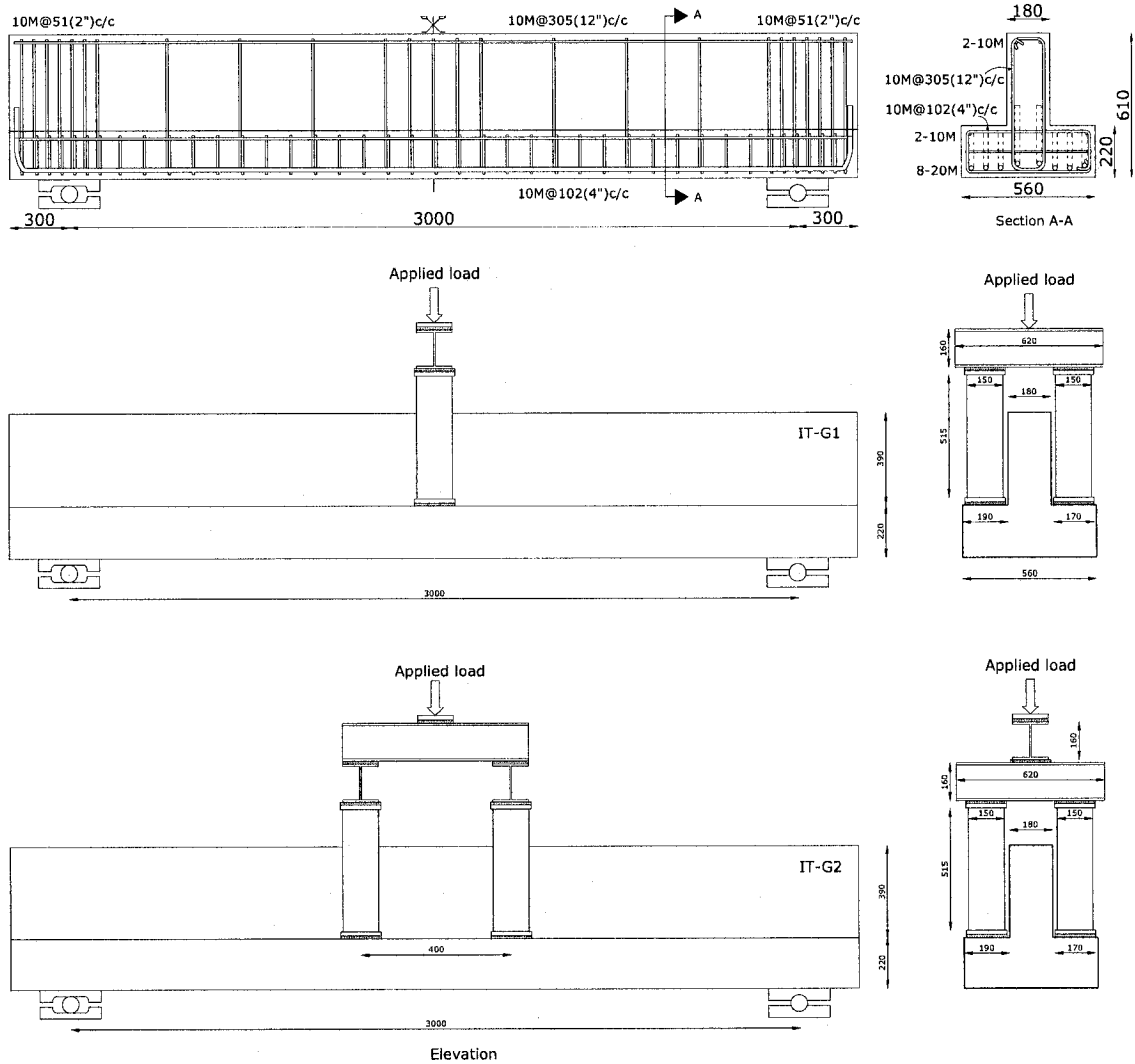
Dimensions, details of reinforcement and test profile for girder IT-G1 and IT-G2
